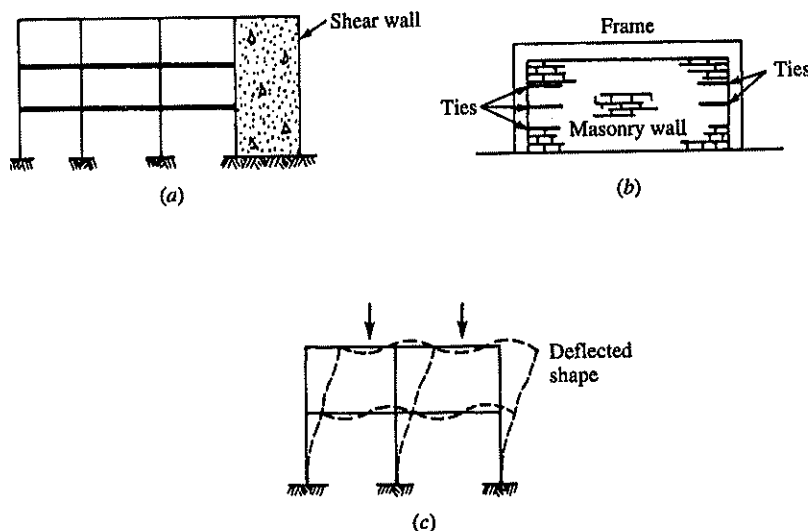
Examples of braced and unbraced frames: (a) frame braced by a shear wall, (b) rigid frame braced by connection to masonry wall, (c) unbraced frame.
